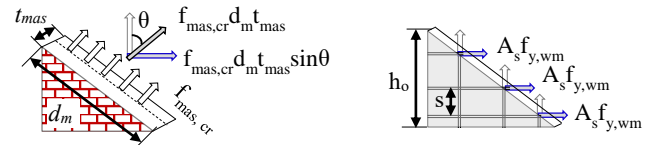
Schematic diagram of FC laminated masonry at cracking
